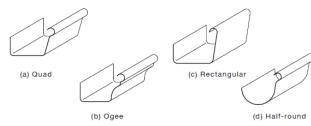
(A) TYPICAL EXTERNAL EAVES GUTTERS
